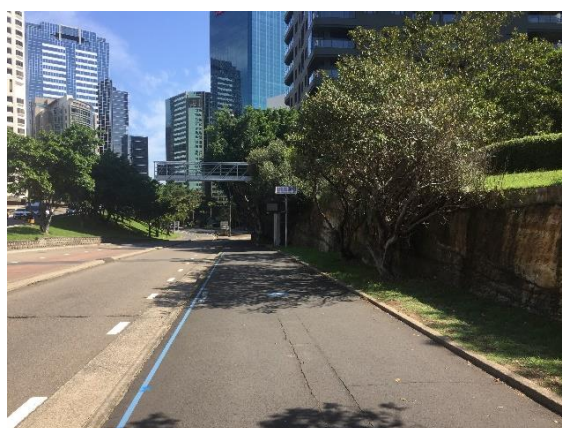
Looking southwest from existing shared-use path to sandstone retaining wall and entrance stairs to National Trust Centre.
